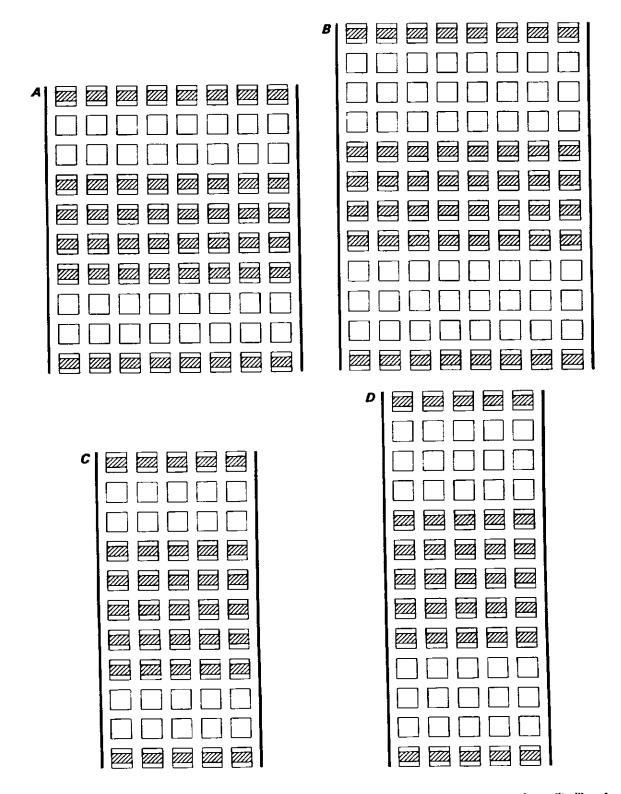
Possible pillar-splitting plan for airblast control. A, nine-entry system, two rows of unsplit pillars for barrier. B, nine-entry system, three rows of unsplit pillars for barrier. C, six-entry system, two rows of unsplit pillars for barrier. D, six-entry system, three rows of unsplit pillars for barrier.
